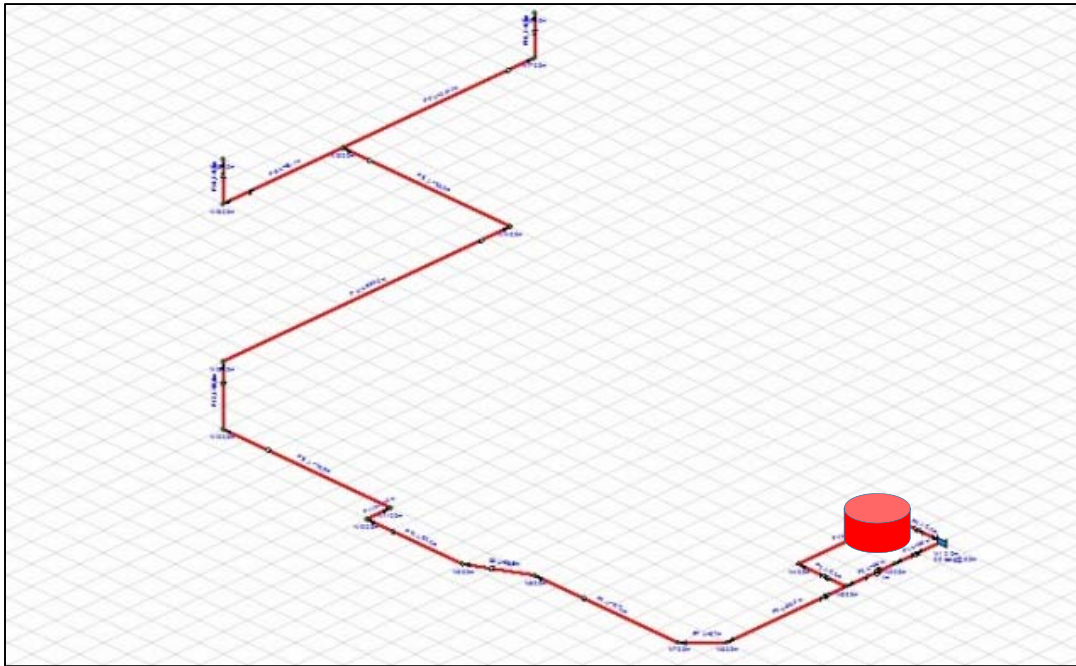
Pipe installation layout with Pipe Flow Expert v5.
